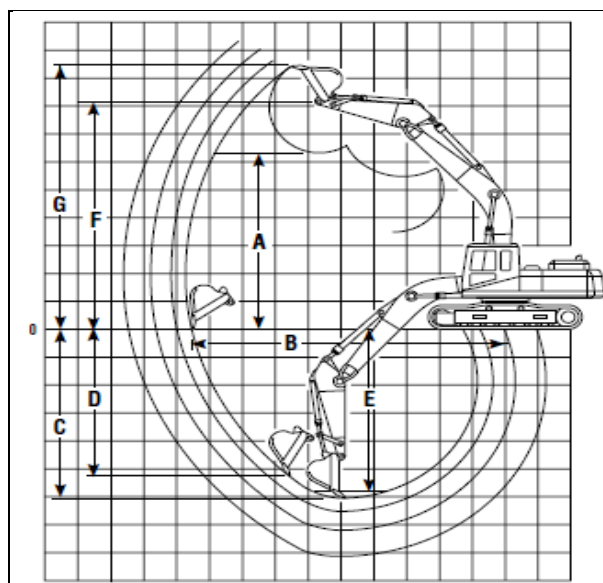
General scheme of hydraulic backhoe-excavator working potential [25]
